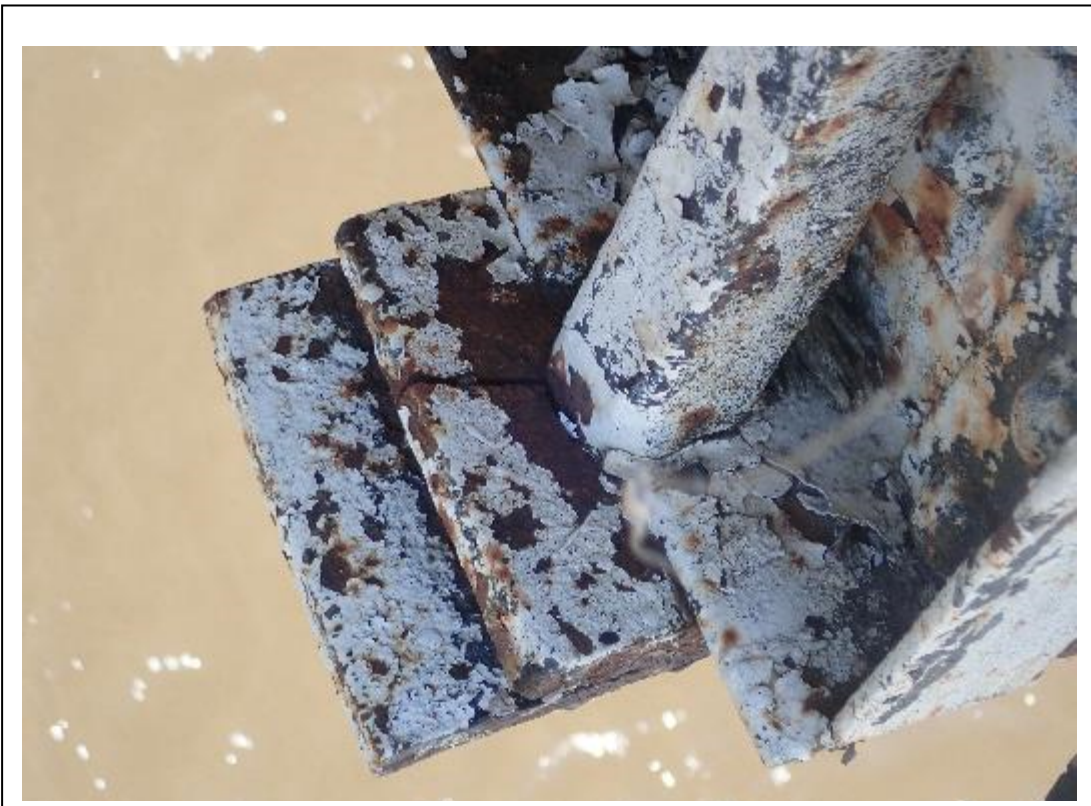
L4E – FLOORBEAM, EAST U-BOLT SPACER PLATE
